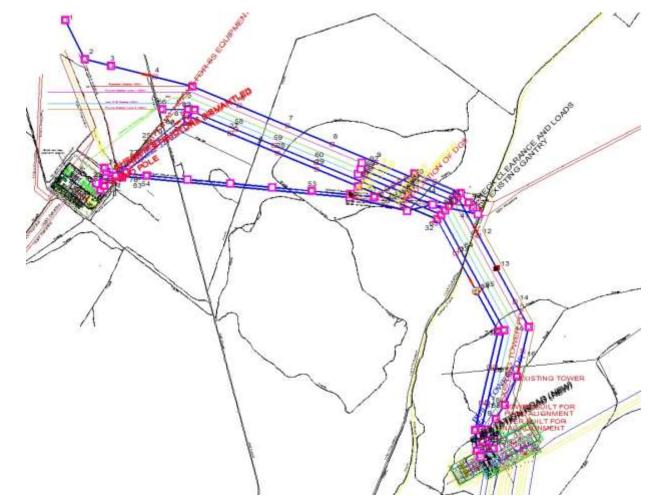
Development plan indicating the proposed construction sites and relevant access tracks that must be used
